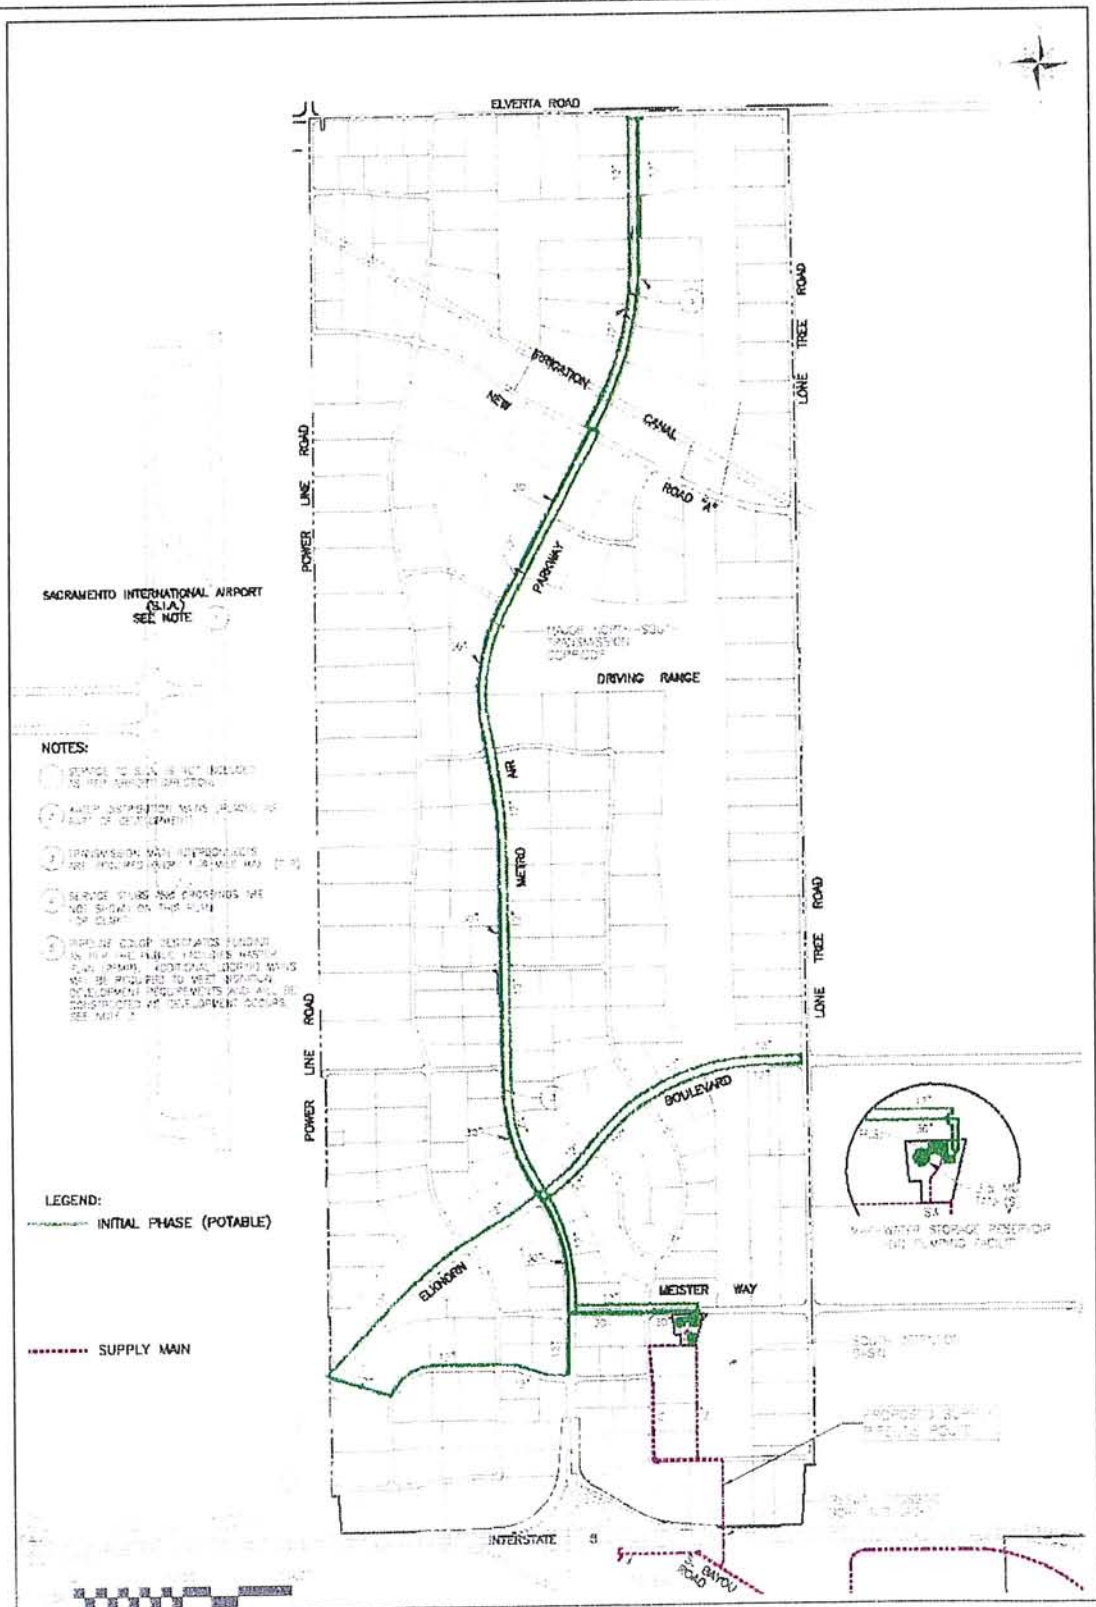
PHASE 1A – WATER FACILITIES PHASING PLAN
